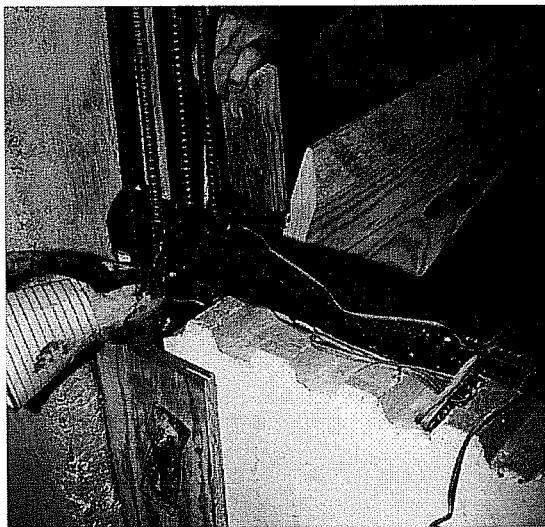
Grouting of Horizontal Shear Lugs in Column
